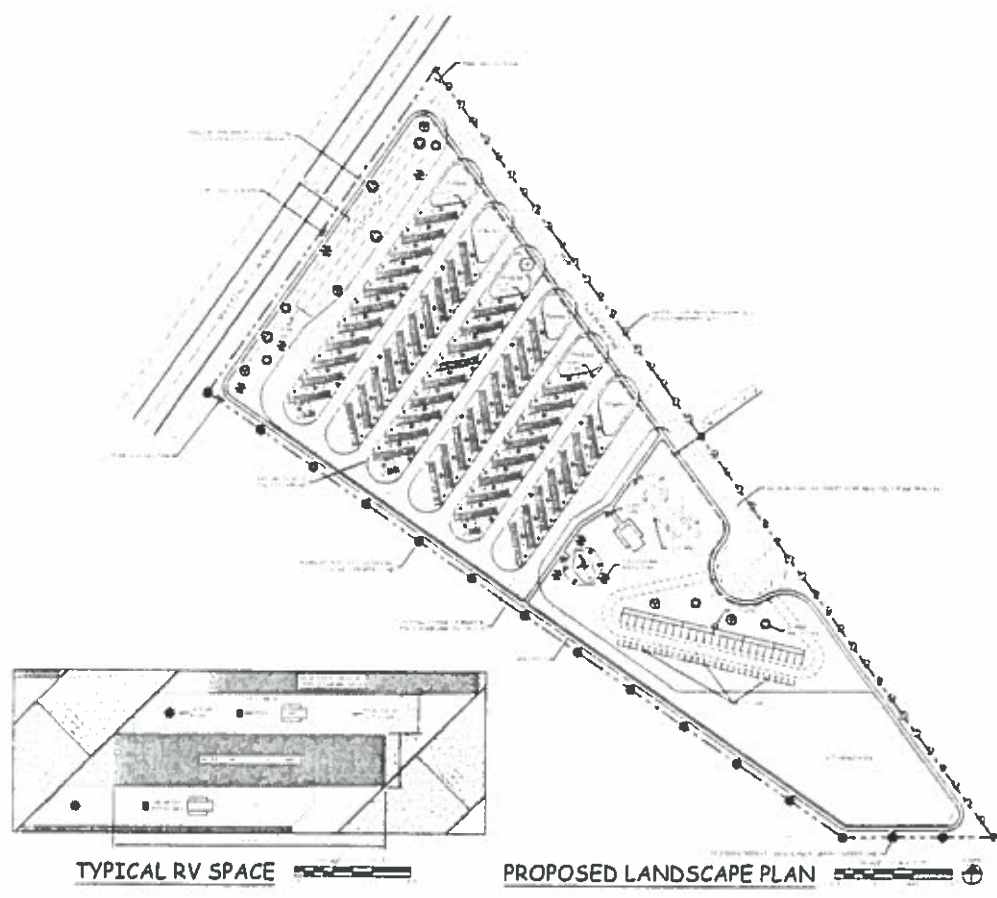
Entirety of proposed plan, including all 54 RV Spaces, dump station, bath/laundry house, and landscaping.
